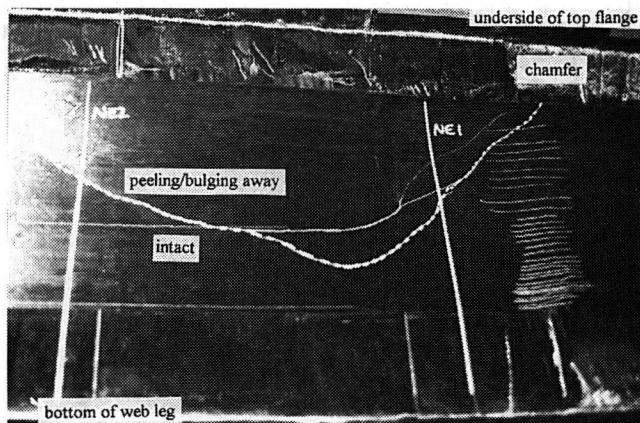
Interior face of one web leg, after failure (Girder 3, Test 1).
